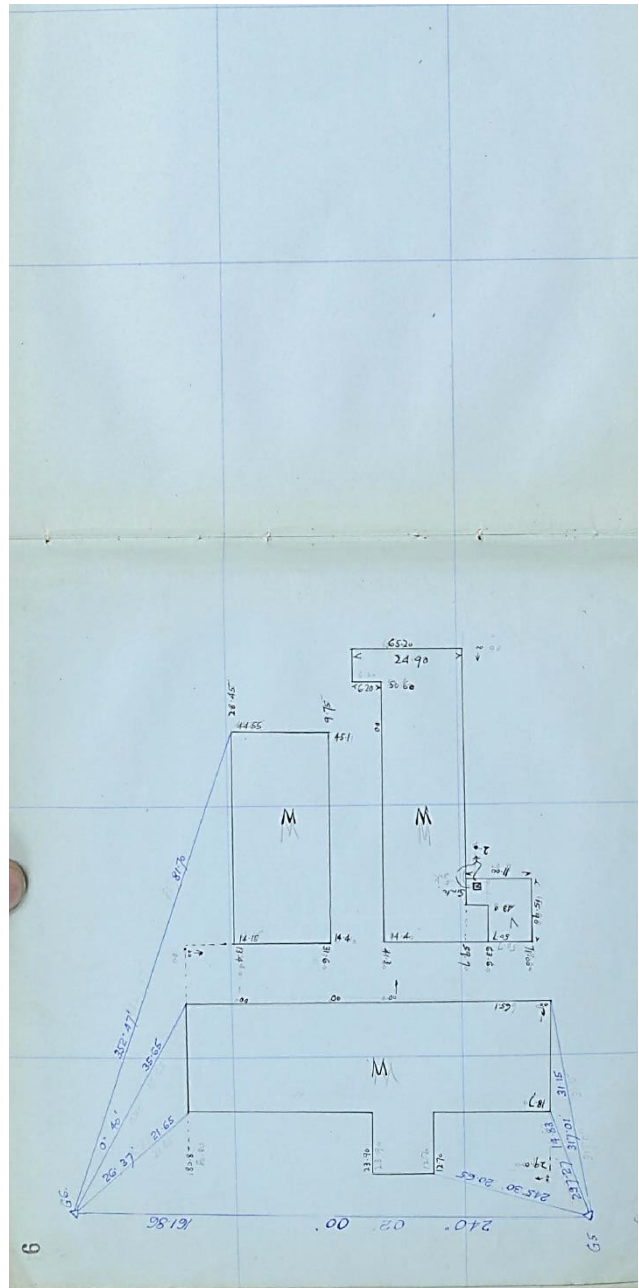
1942 detail sheet indicating timber structures which were erected to north of Gowan Brae House
